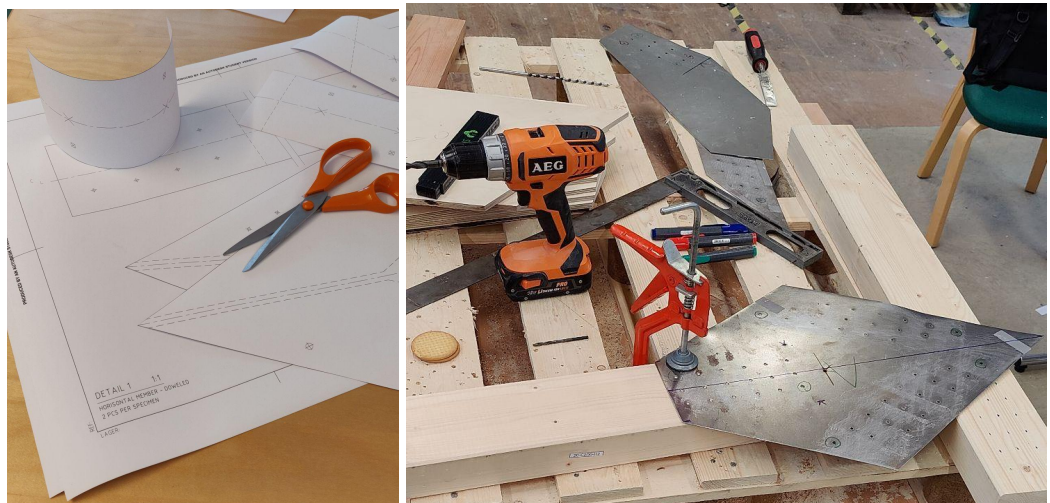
Printed out drawings in 1:1 scale (to the left) and drilling template (to the right)
